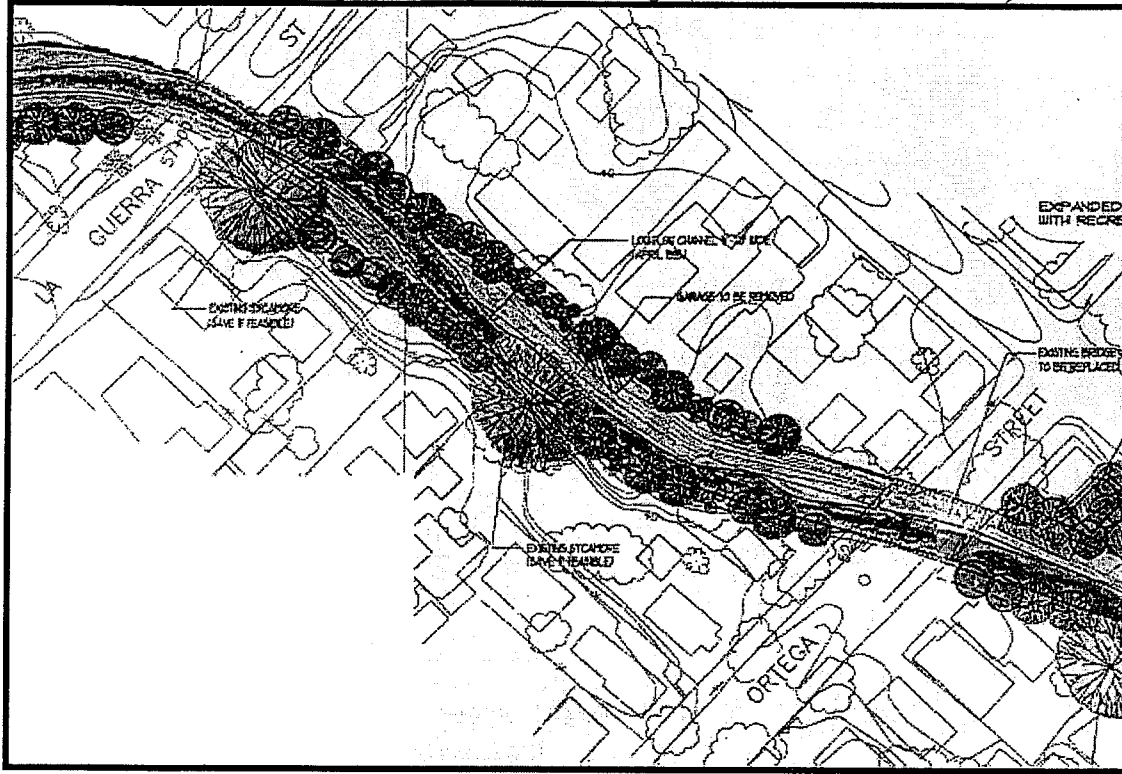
De La Guerra Street Bridge to Ortega Street Bridge
